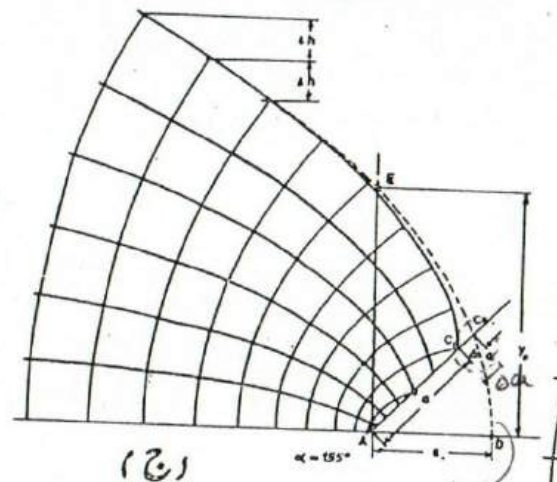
Seepage through embankment on impervious foundation (after Gilboy³).
